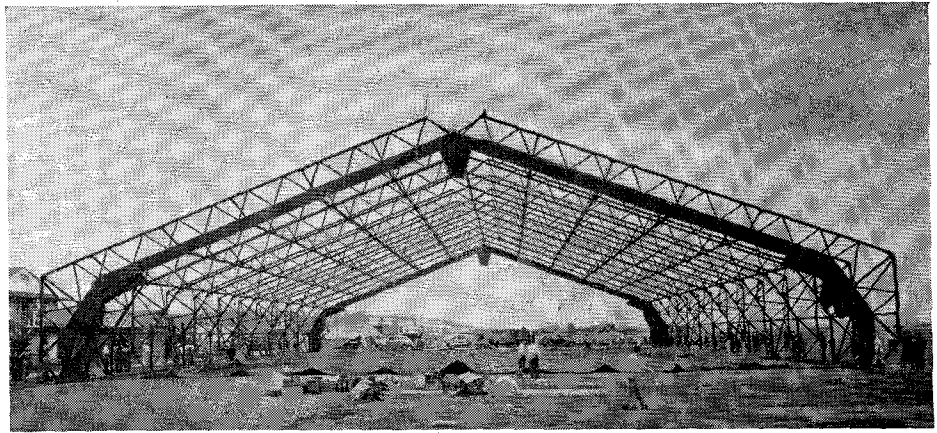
After the steel trusses are in place, the canvas roof is assembled on the ground, then raised as a unit.
